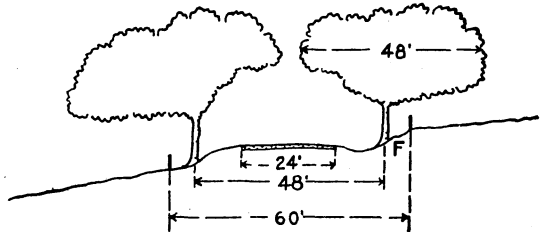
A 60-foot right of way with a 24-foot section, the trees being placed 24 feet from the center line of the road, which is probably the nearest practicable distance. The footpath (F) is outside the tree rows
